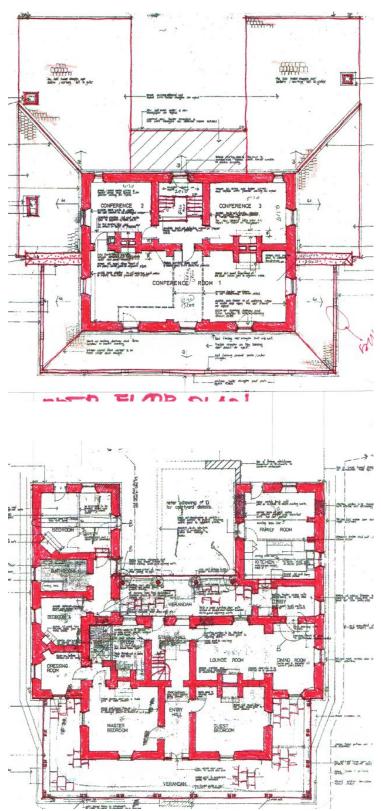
Closebourne House floor plans showing proposed works 1983. Source CMP 2005 "Restoration of Closebourne House at Morpeth Conference Centre' by H.O. Woodhouse & Danks Architects, August 1982. Geoffrey Danks, architect. North down the page.
